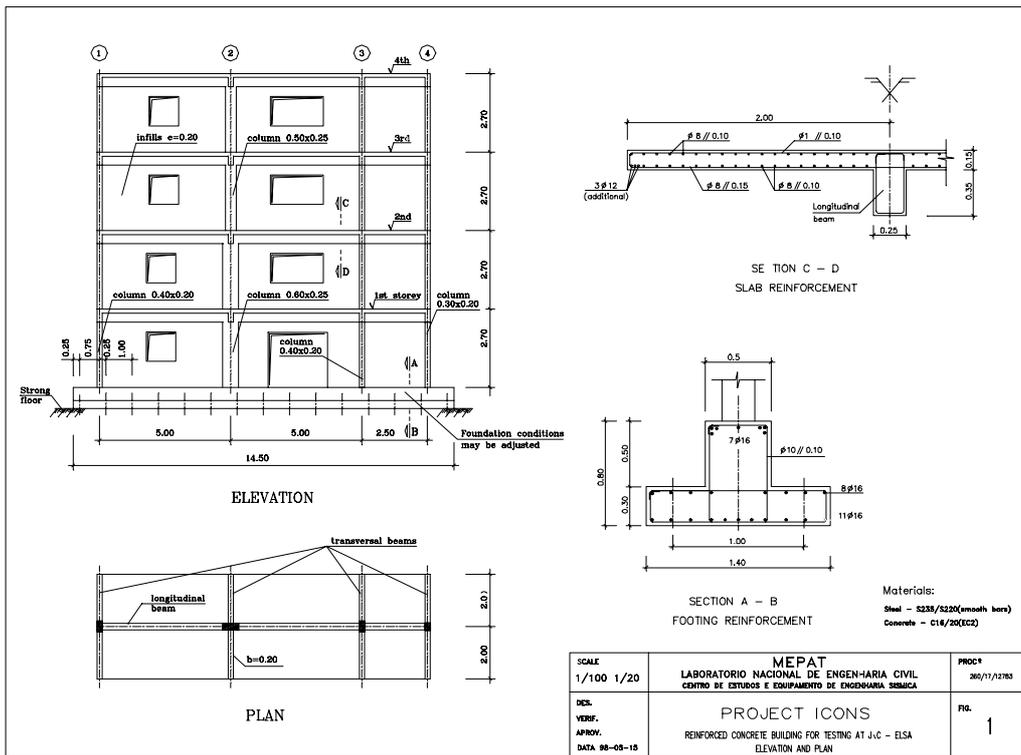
Plan and elevation views of concrete frame plus masonry infill building.
